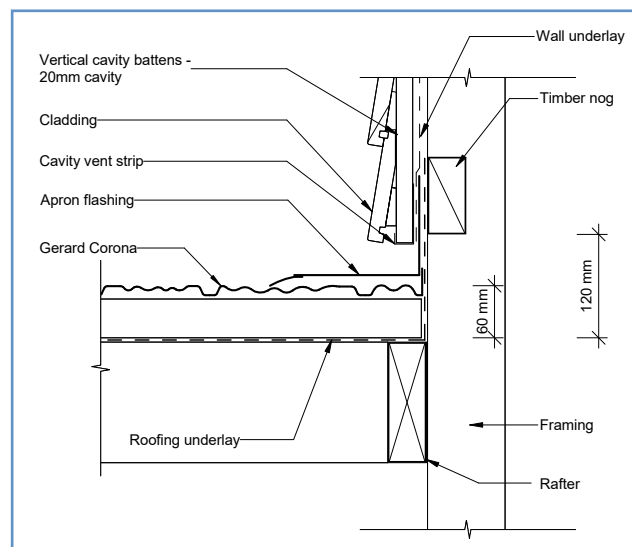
Positioning of apron flashing lap for installation
